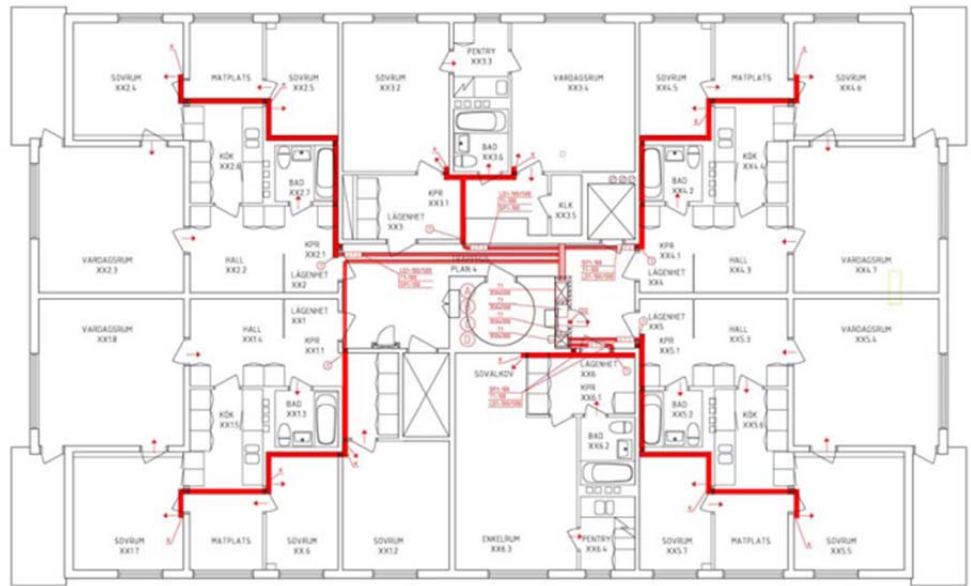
Example: Upgrade of a building with one central unit and outlet pipes colored red
